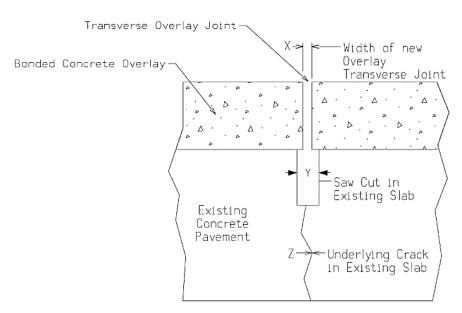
Illustration of BCOC joint saw cut depth and width requirements
